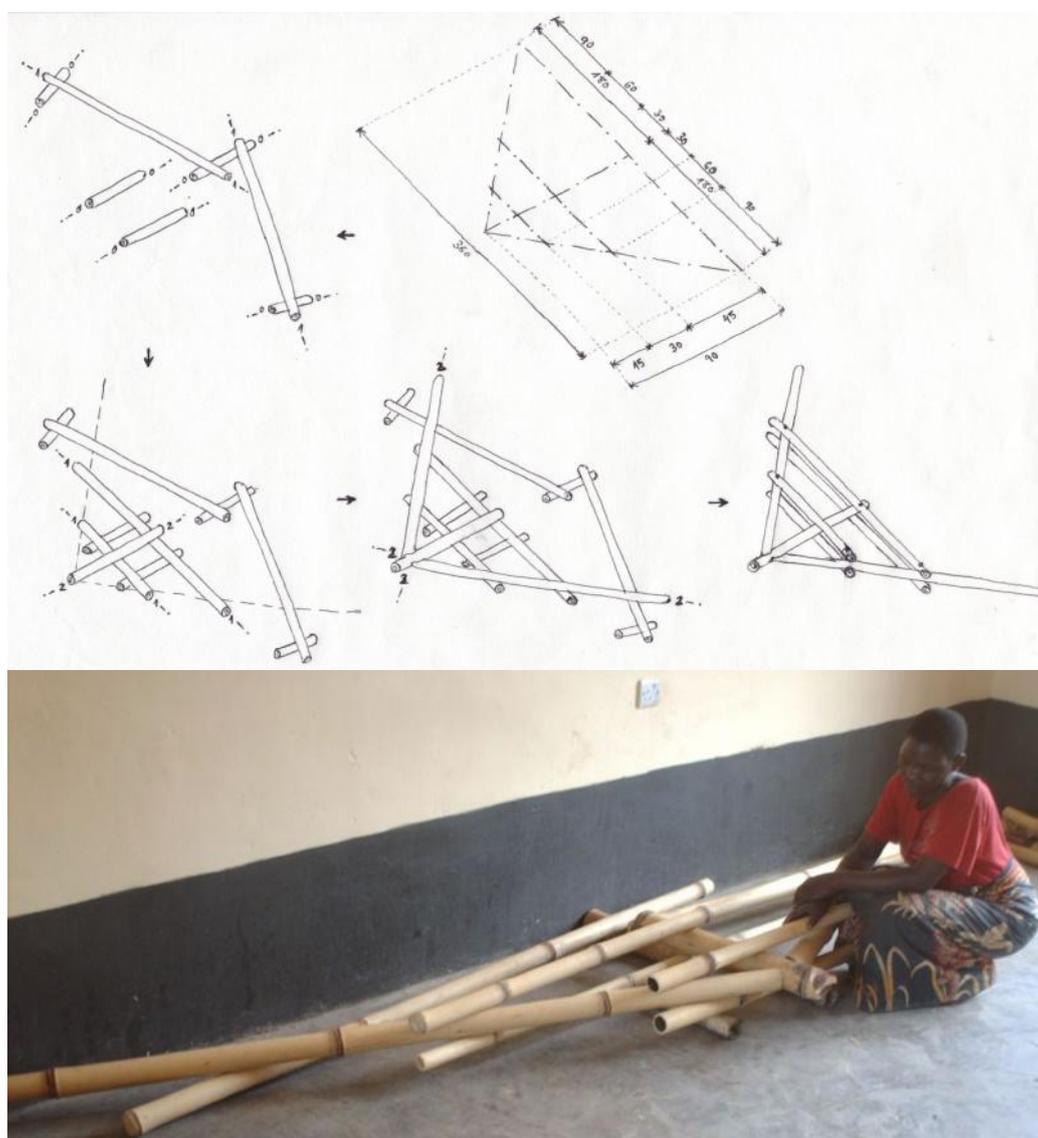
A. Roof trusses diagrams - B. Roof trusses construction
